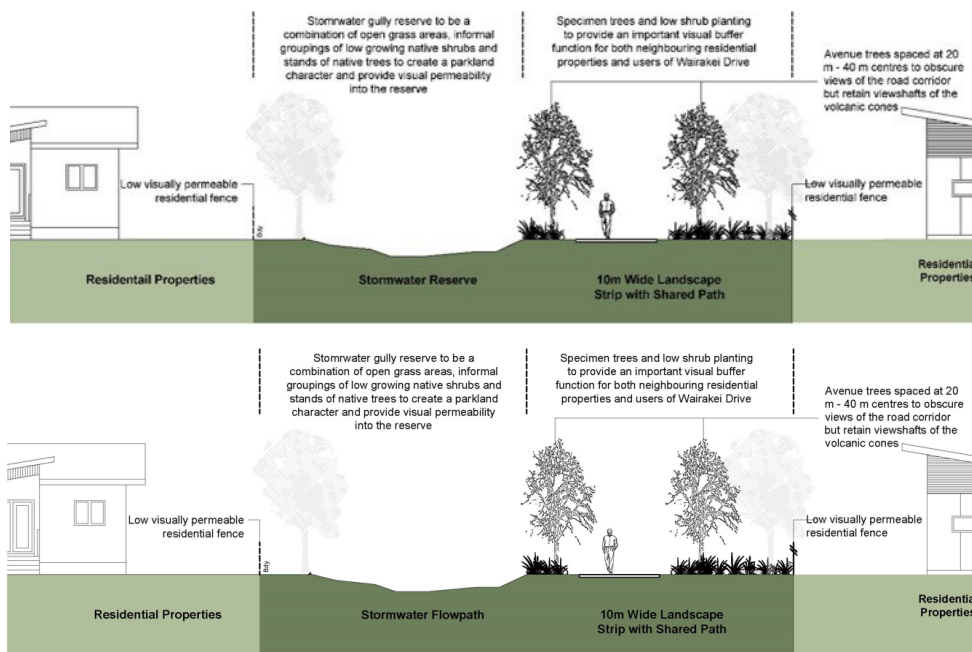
B: Cross section illustrating the Stormwater Reserve frontage
